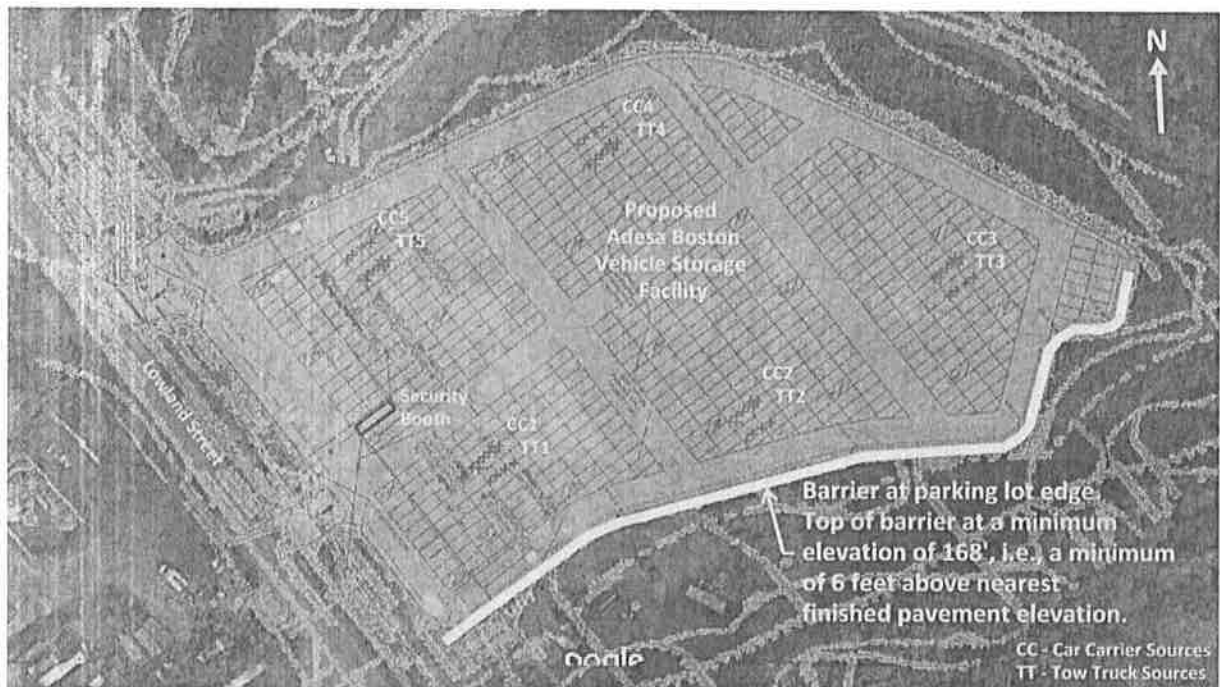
Sound control barrier along southeast pavement edge, with its top-edge at a minimum elevation of 168' i.e., extending a minimum of 6 feet above the nearest pavement elevation
